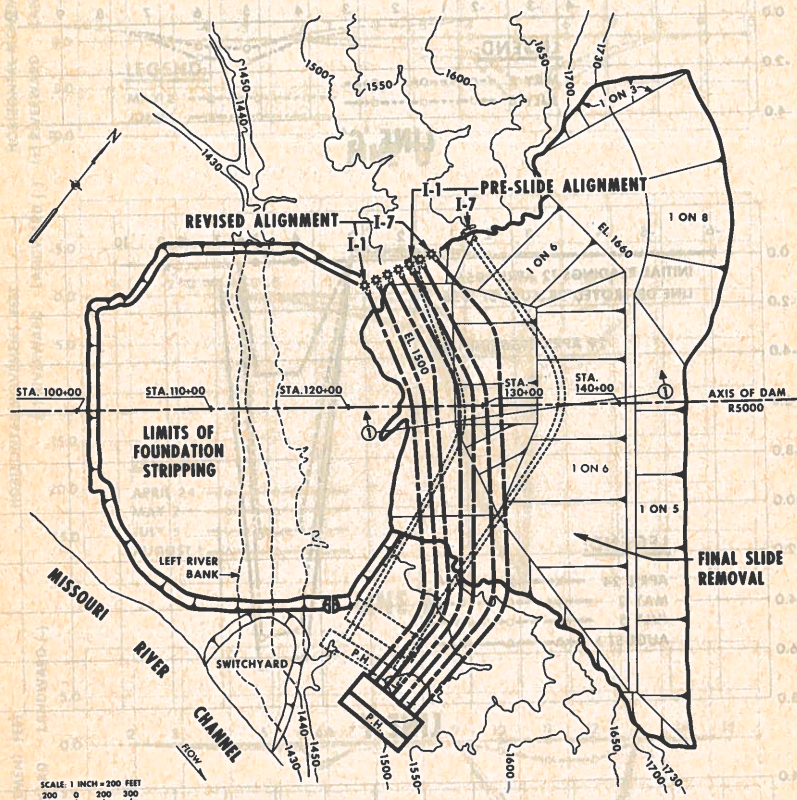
FOUNDATION TREATMENT, LEFT ABUTMENT
